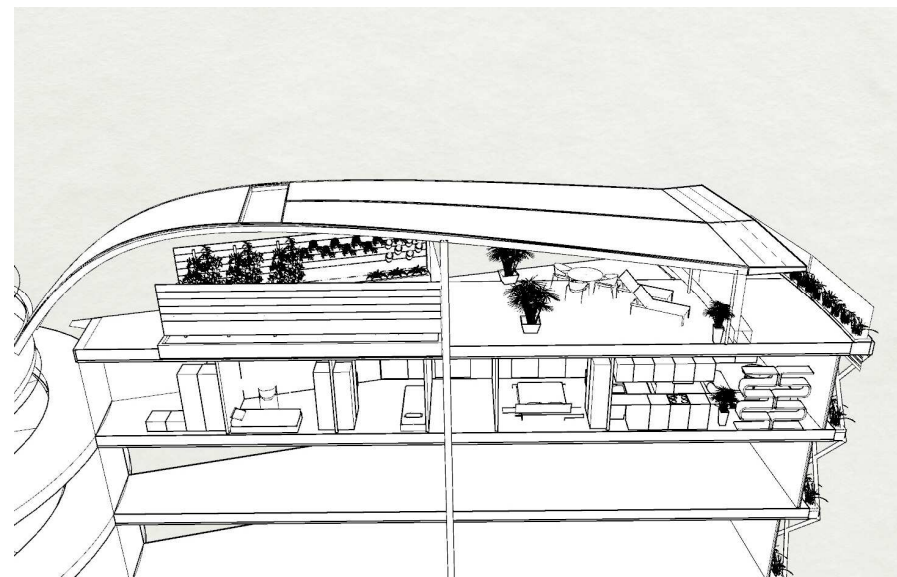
Section from the Light ETFE roof and upper spaces of the building.
